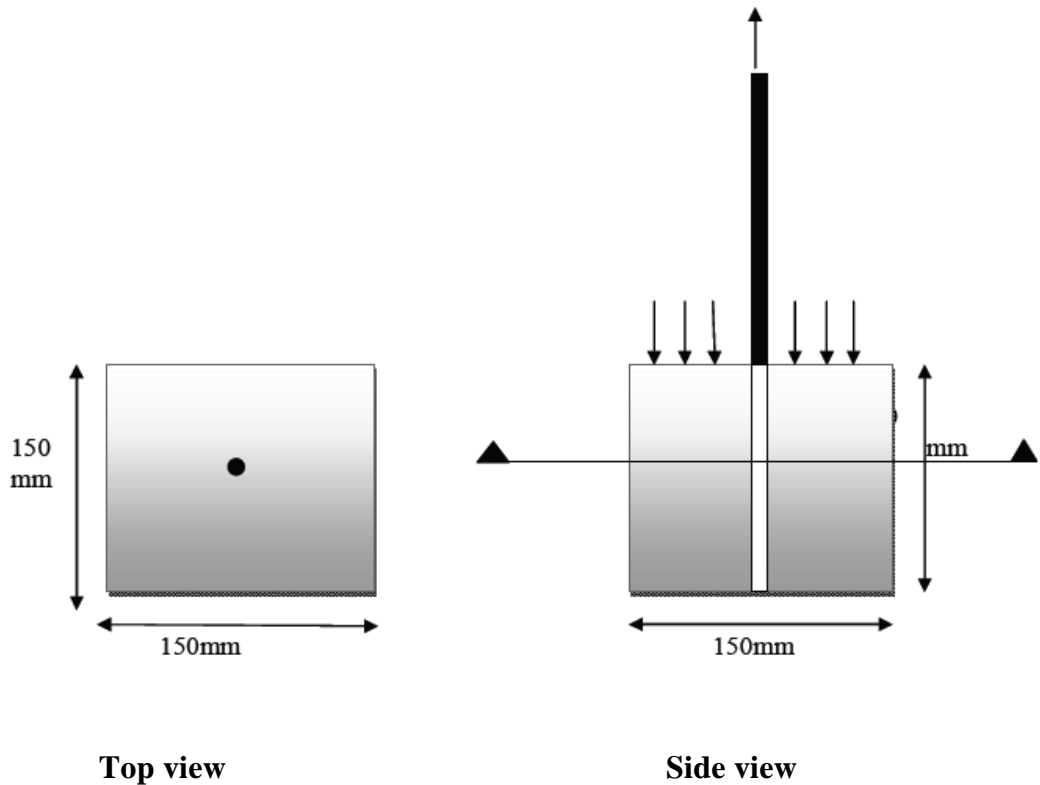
The dimensions of pull out test specimens, the location and the length of embedded deformed steel bar in concrete specimens
